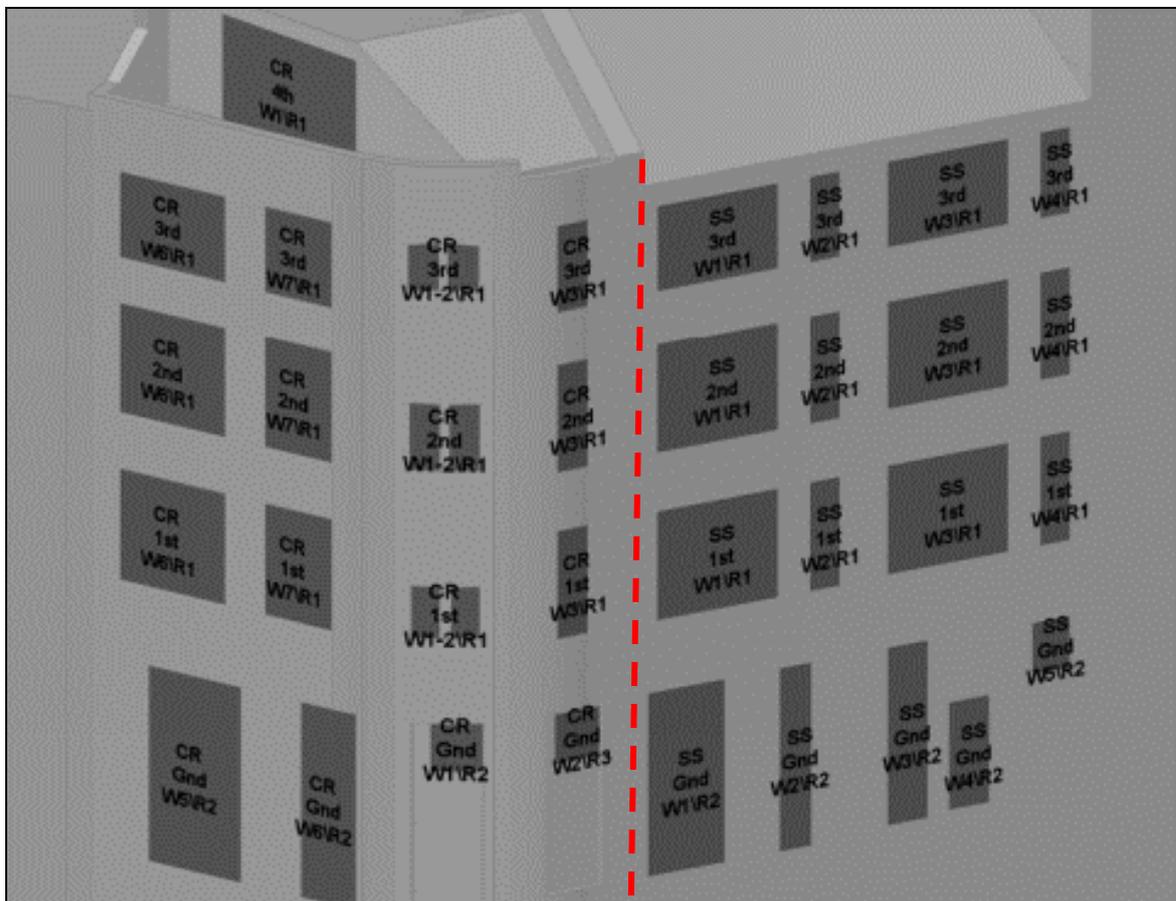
Window plan of 5 Crescent Row and 1-2 Sycamore Street
